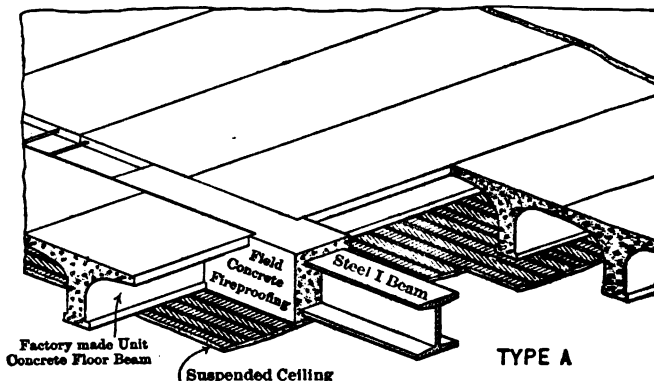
Watson Reinforced-concrete Floor-construction. Without Slabs
